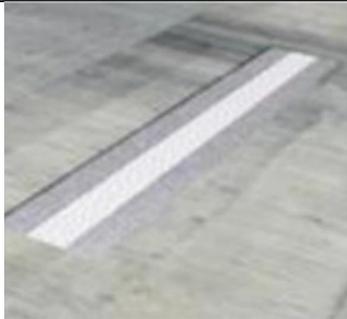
Cast-in Anchor Channels Connecting the Curtain wall brackets to the concrete slab
